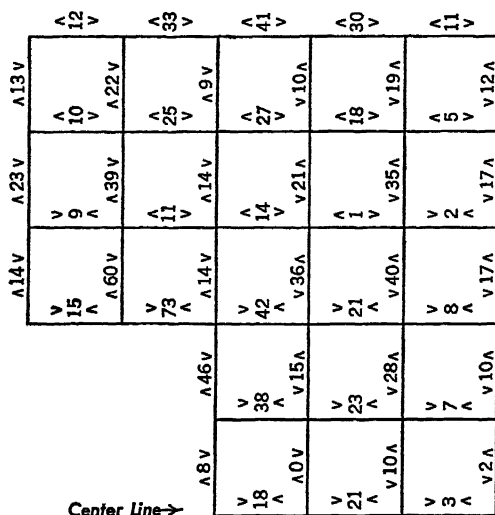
GIRDER FORCES AND COLUMN SHEARS.
